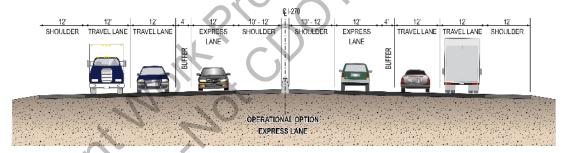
Typical Roadway Section without Auxiliary Lane *Source: Jacobs
